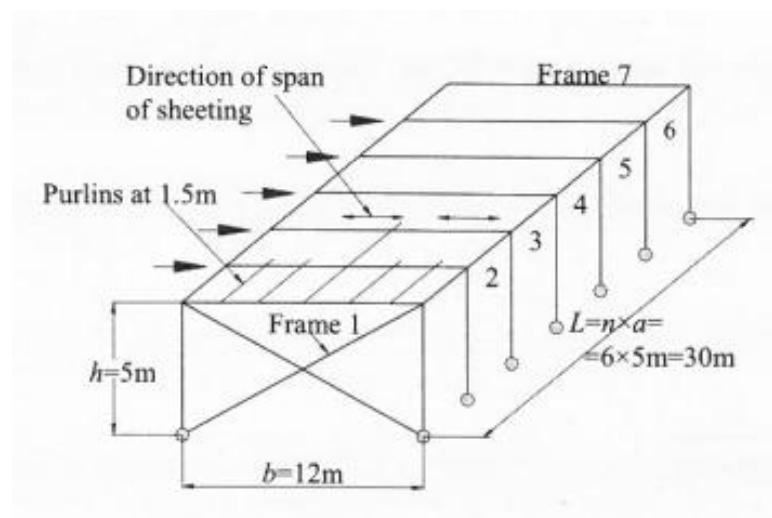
Flat roof building with roof sheets on purlins (ECCS, 2012)
